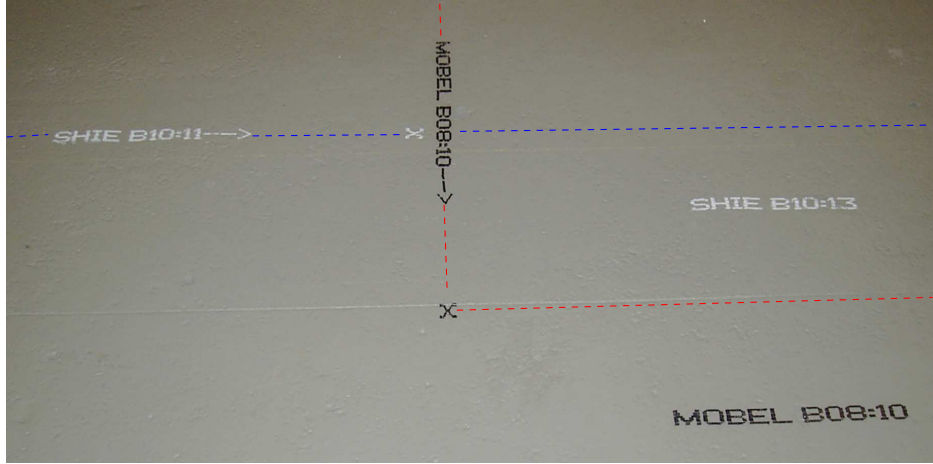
An example of how it looks on the floor when two fairs have been marked. The blue and red dashed lines have been overlayed to indicate where the walls would be placed. Note how one of texts is outside the wall and thus still readable when the walls have been built.
